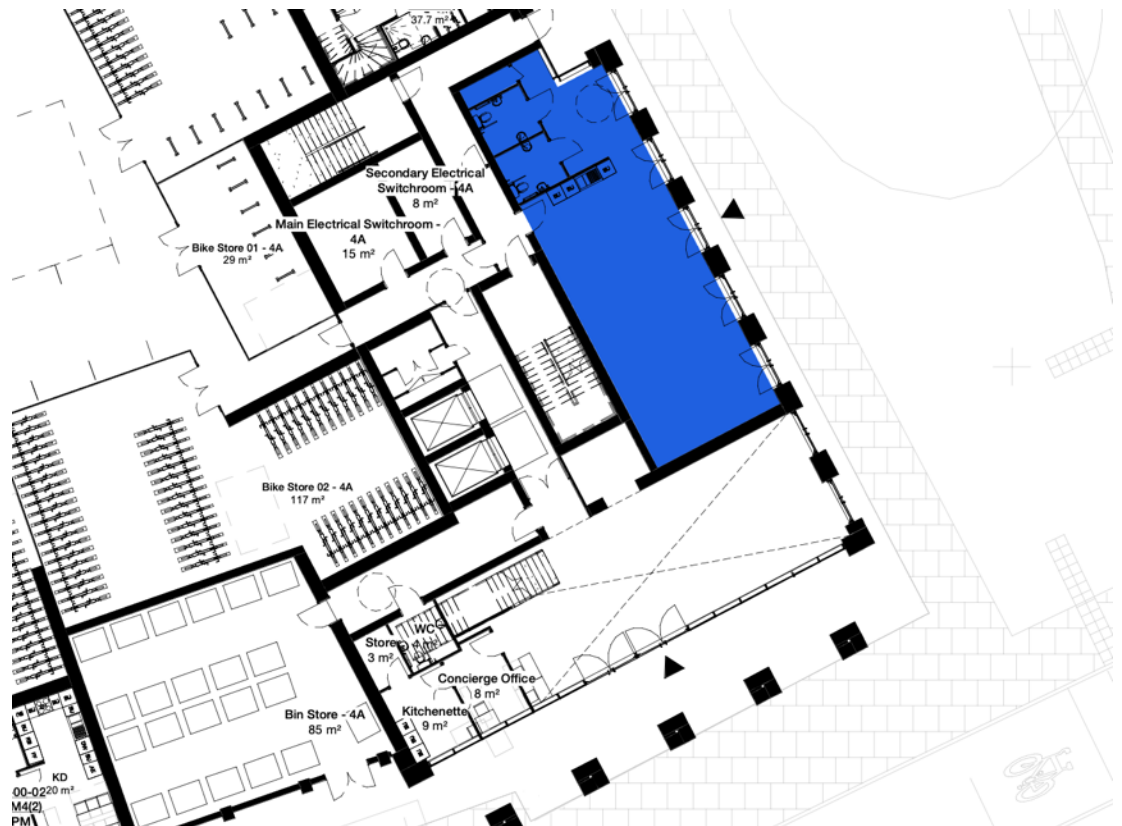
Extract from proposed ground floor plan of subplot 4 showing the proposed commercial unit in blue
